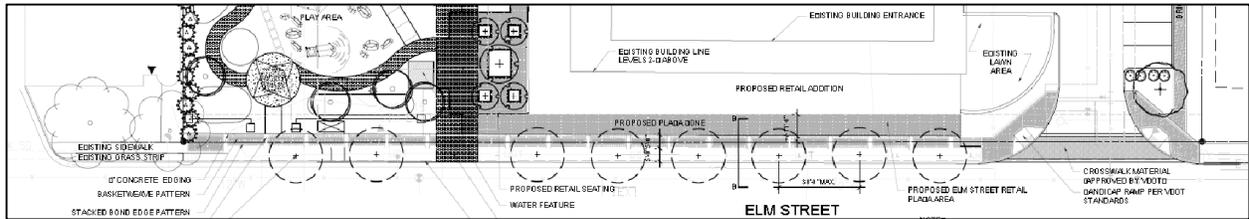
The Elm Street streetscape (Source: Bowman Consulting, June 1, 2014)
